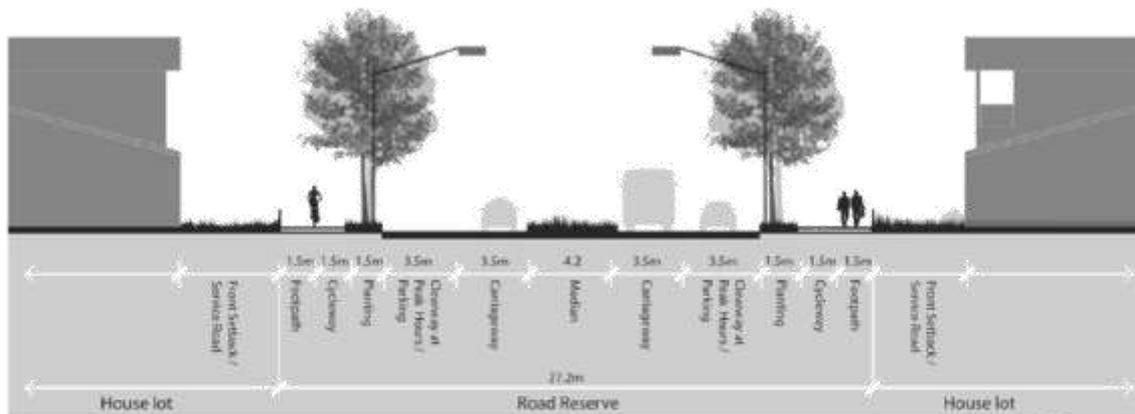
Indicative Rickard Road Transit Boulevard section (with Optional Median)
